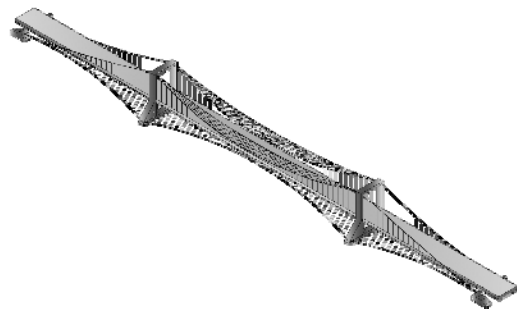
Prestressed suspension bridge with cable truss load carrying structure
